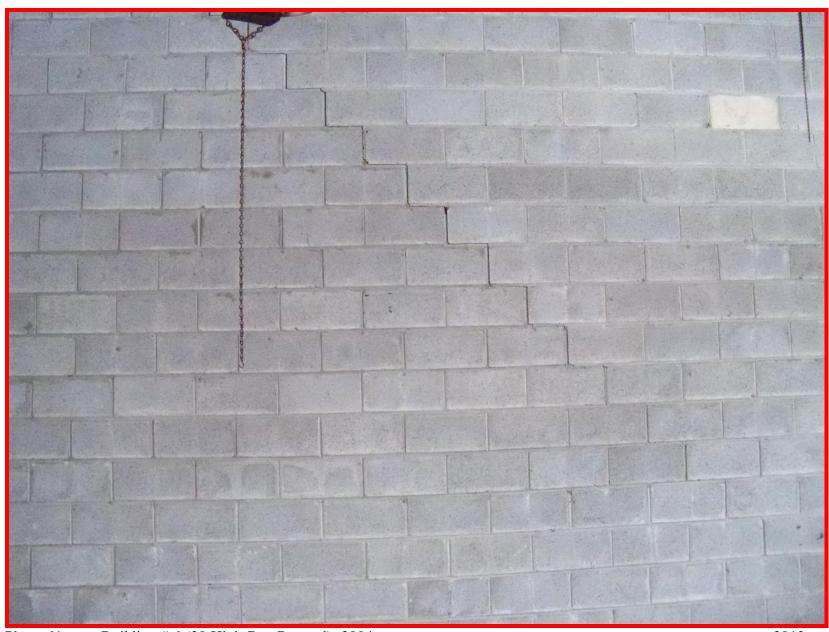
Building # 6 (39 High-Bay Beyond) 2004 Cracked masonry
